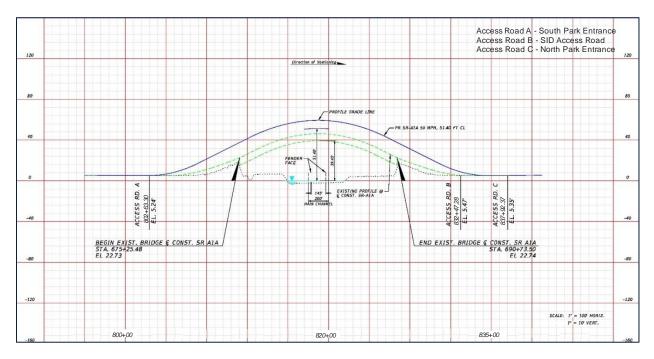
PREFERRED ALTERNATIVE BRIDGE PROFILE
